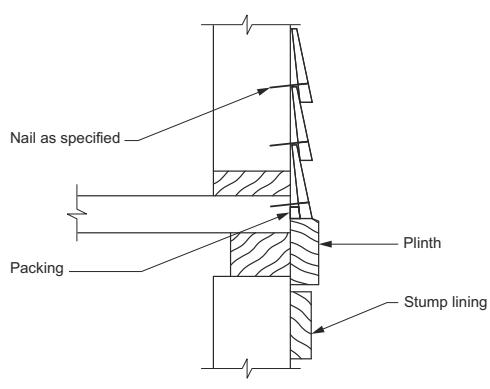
Fixing of wall cladding — Timber cladding
